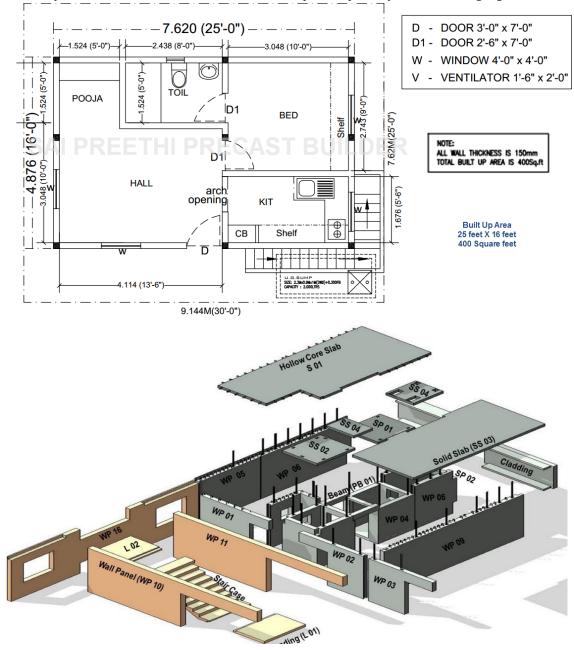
(BUILDING PLAN FOR CALCULATION)
